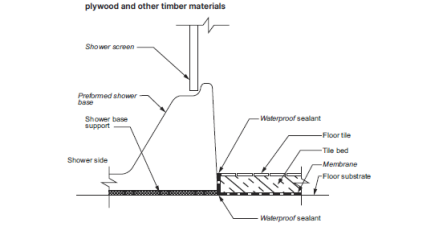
Typical preformed shower base/wall/floor junction
